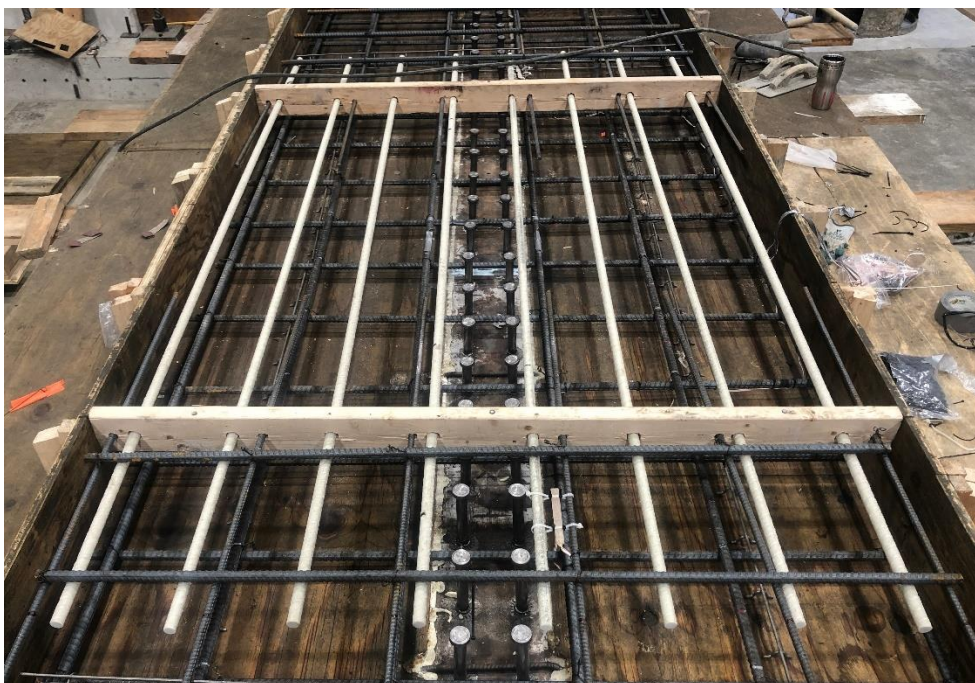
Link slab 2 as constructed in the laboratory
